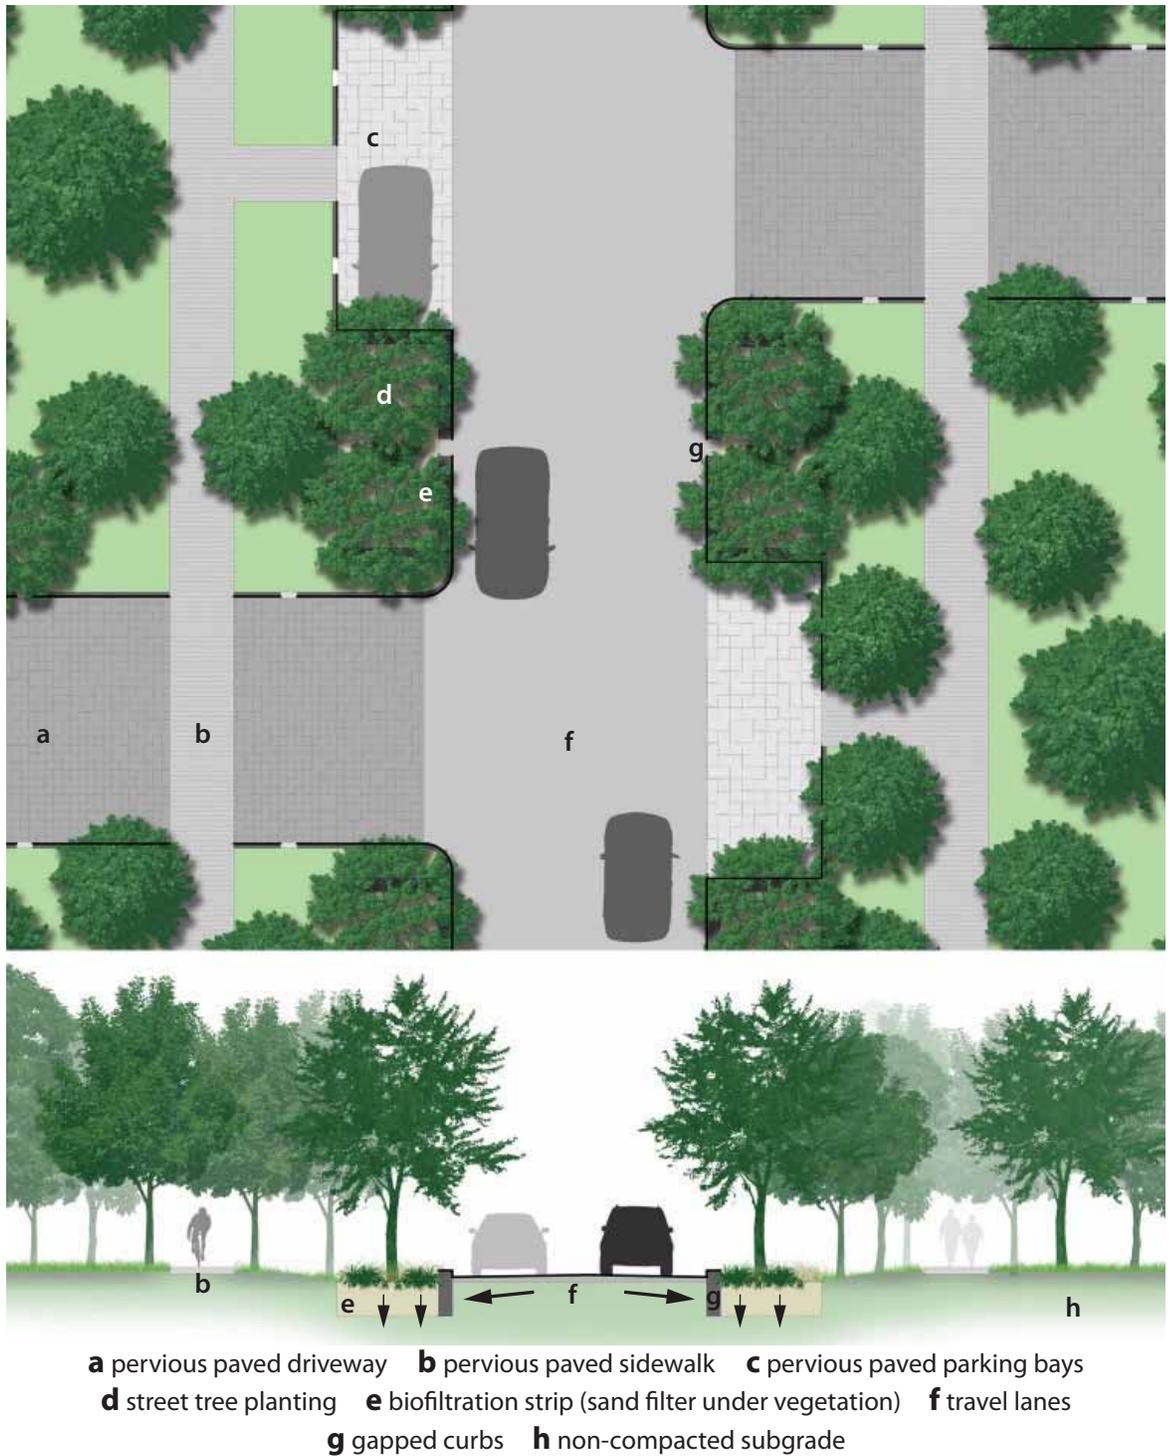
Above, plan of a typical roadway biofiltration strip Below, section of a typical roadway biofiltration strip
